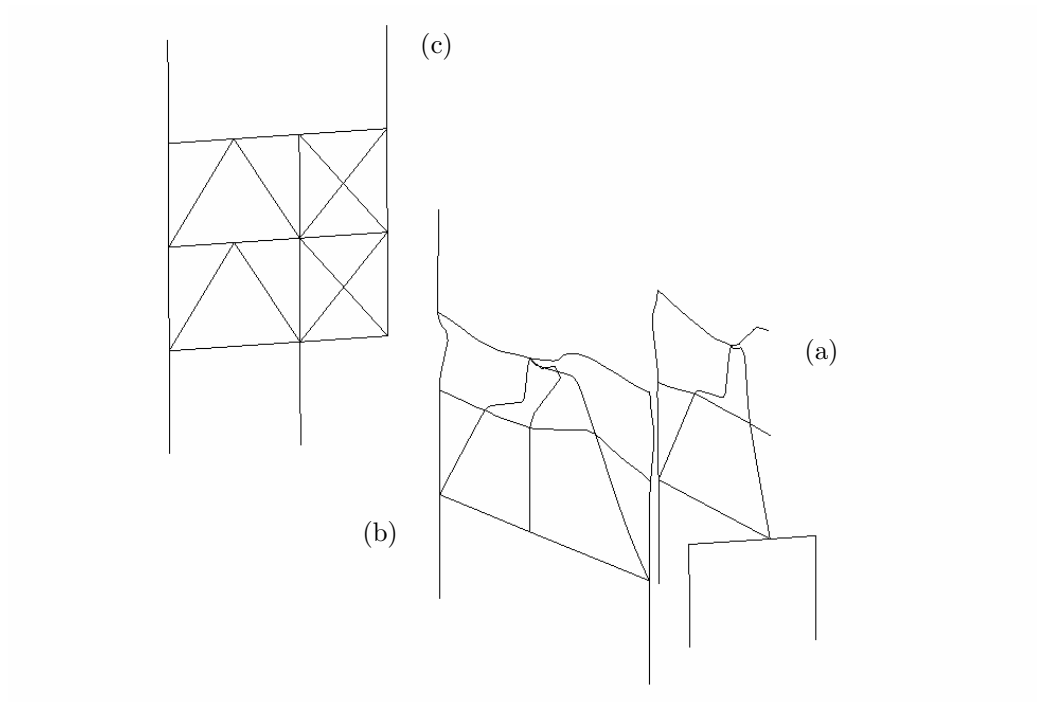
Deflections (scale 1:1) of (a) Truss 1, (b) Truss 2 and (c) Truss 3
